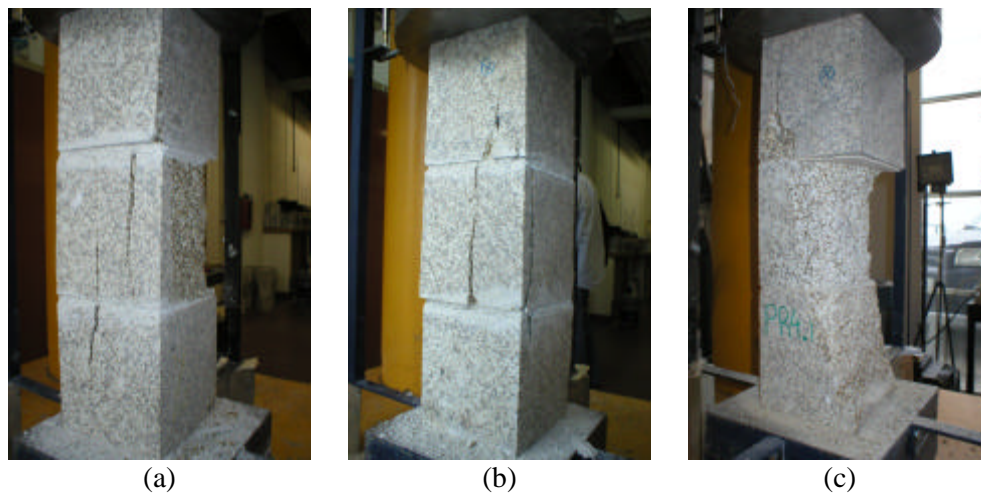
Characteristic failure patterns of masonry prisms; (a) and (b) specimens PR_SM; (c) specimens PR_SS
